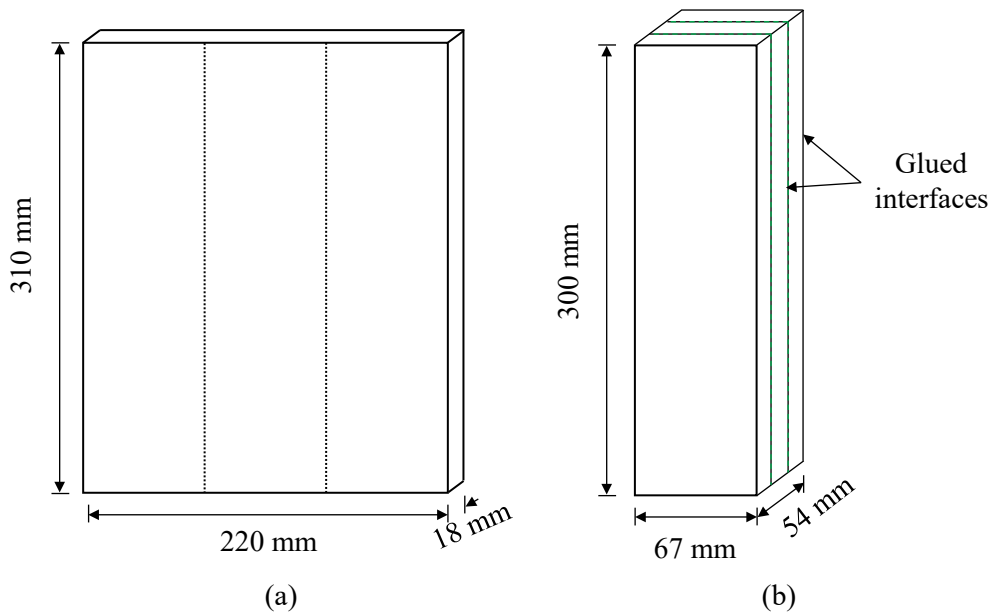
Dimensions of (a) test piece and (b) final compressive coupon from OSB panel
